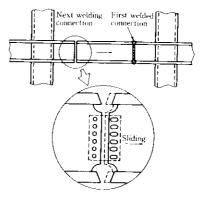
Consideration of shrinkage due to welding in girder-to-girder
